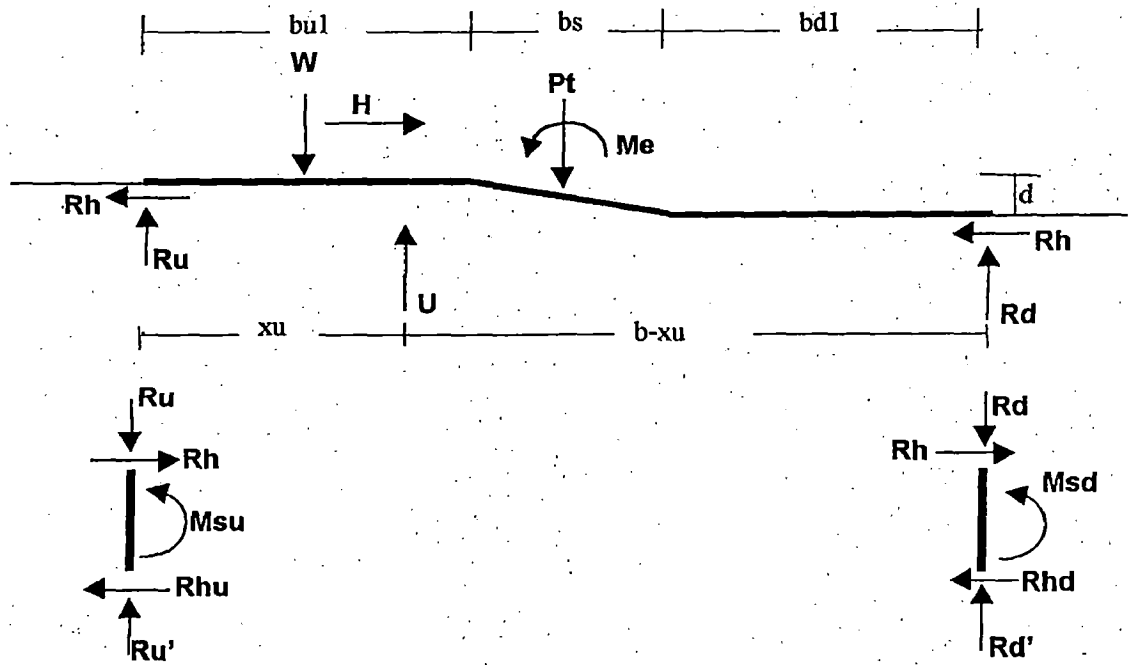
Equilibrium of Forces Acting on The Barrage with Floating Floor and Ribbed Foundation
